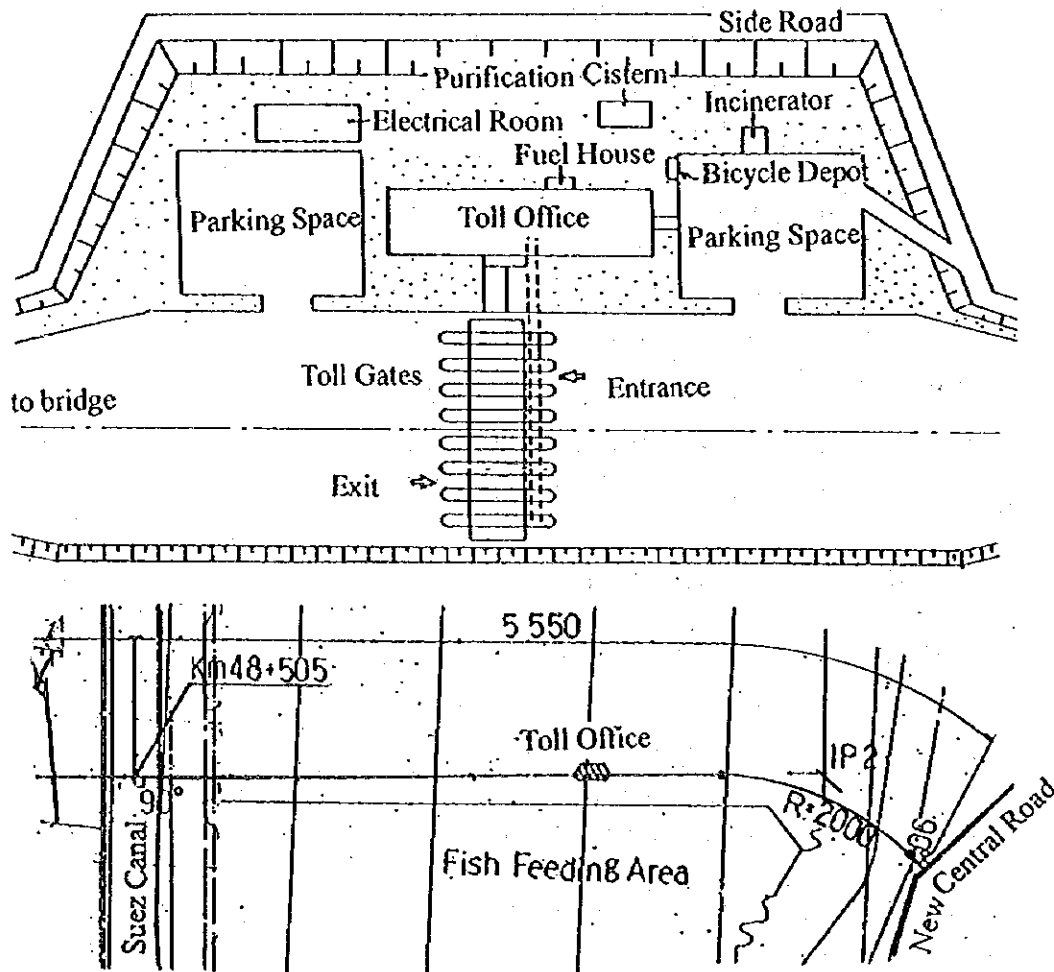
Arrangement of Toll Collection Office (Example)
